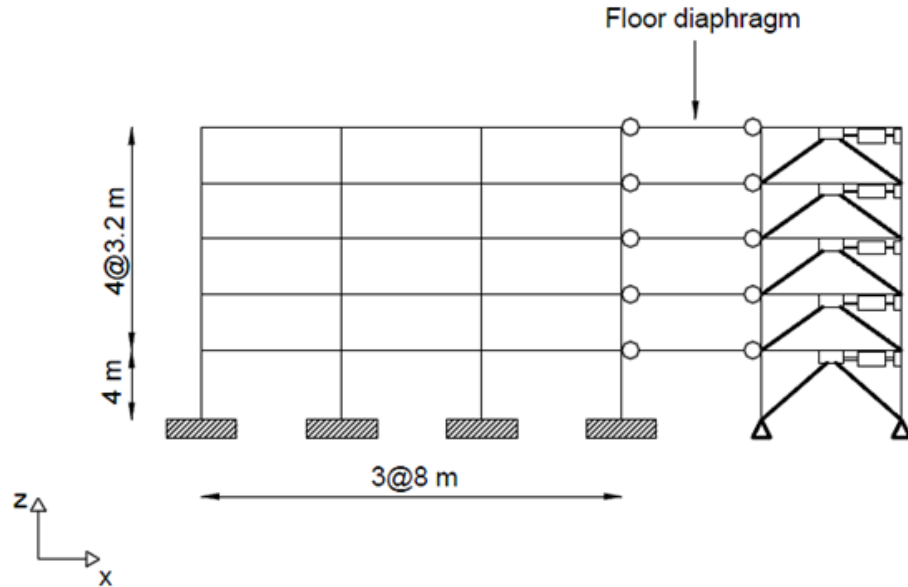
Elevation view of a prototype building with SC-MRFs and viscous dampers
